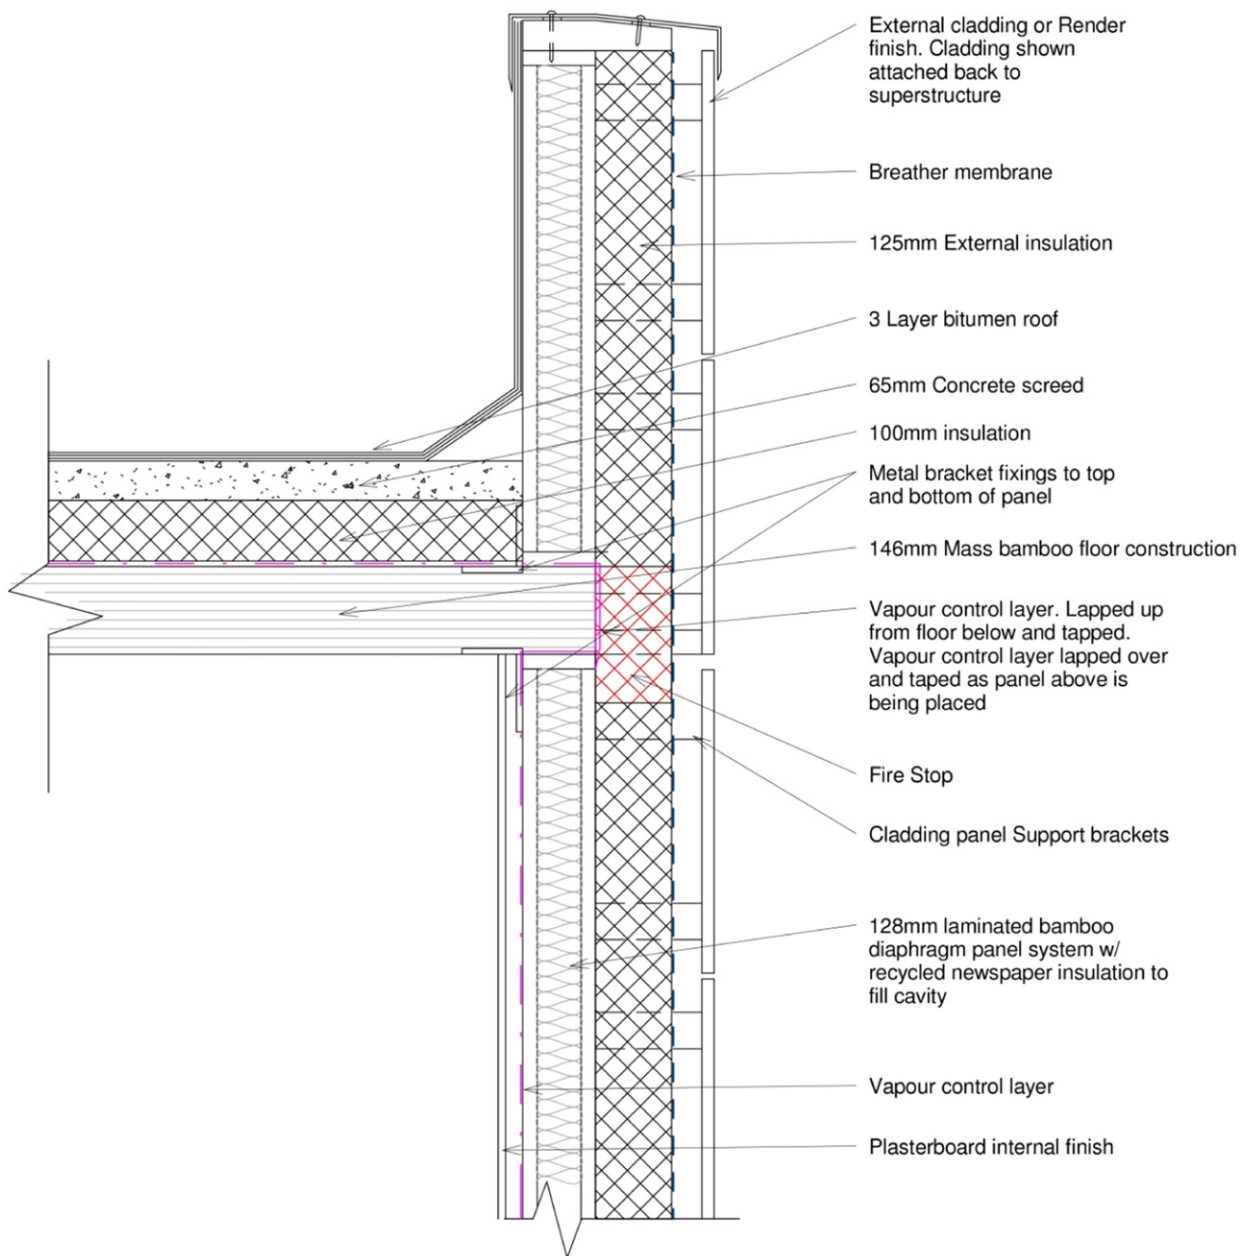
Construction detail B (Not to Scale) (Parapet) for LVB panel system.
